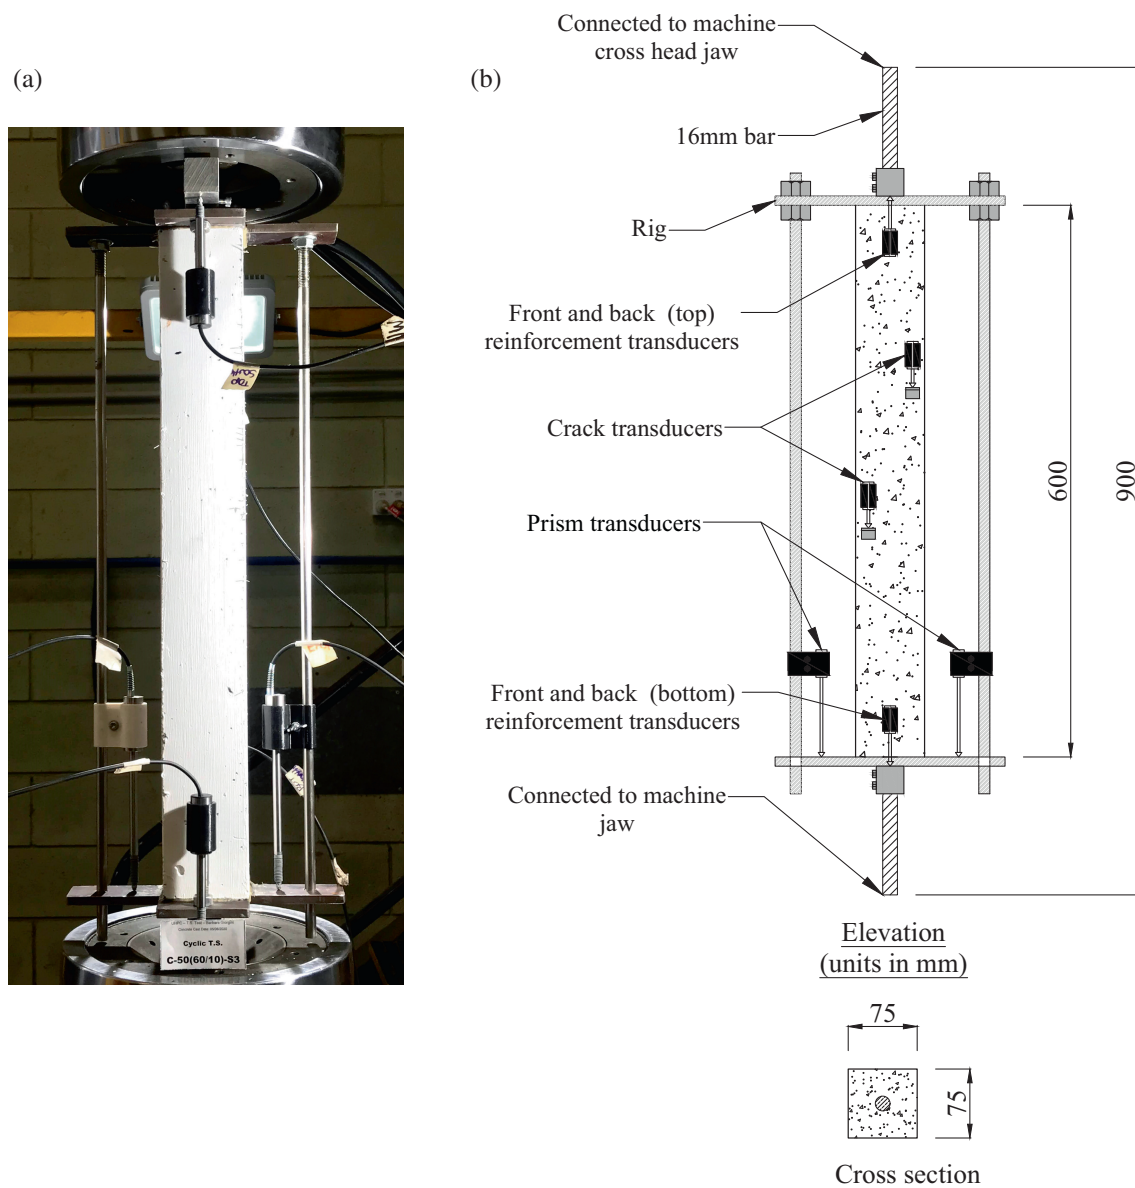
Tension stiffening test set up: (a) Specimen set up and (b) elevation and cross-section.
